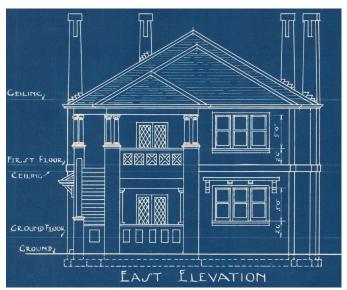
From the original drawing for 'Westbury Court' 147 Westbury Close, showing the east/front elevation (Source: Council Building File)
